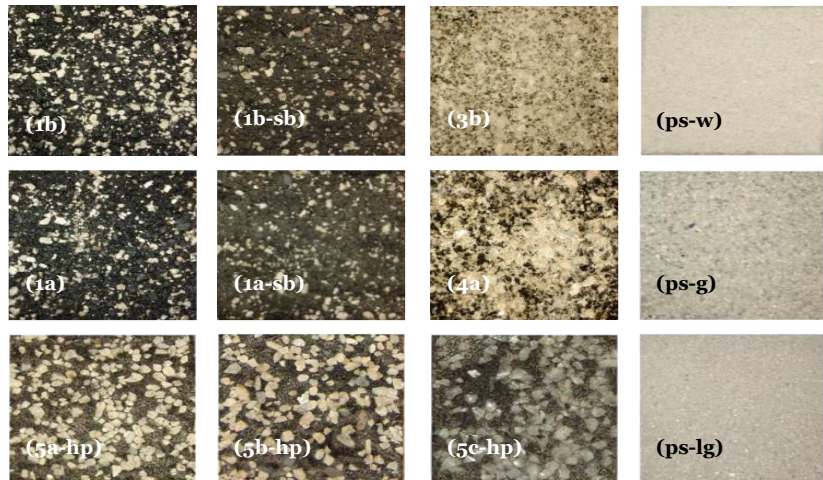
Manufactured pavement samples and factory-made paving stones. On the top row samples are presented: the crushed cement concrete samples 1b, 1b-sb, 3b, and the small white paving stone ps-w. In the middle row are limestone samples are presented: from the left 1a, 1a-sb, 4a and the large grey paving stone ps-g. On the bottom row, from the left, are samples 5a-sb (Solheim limestone), 5b-sb (Törmä limestone), 5c-sb (crushed waste glass), and the large light grey paving stone ps-lg.
